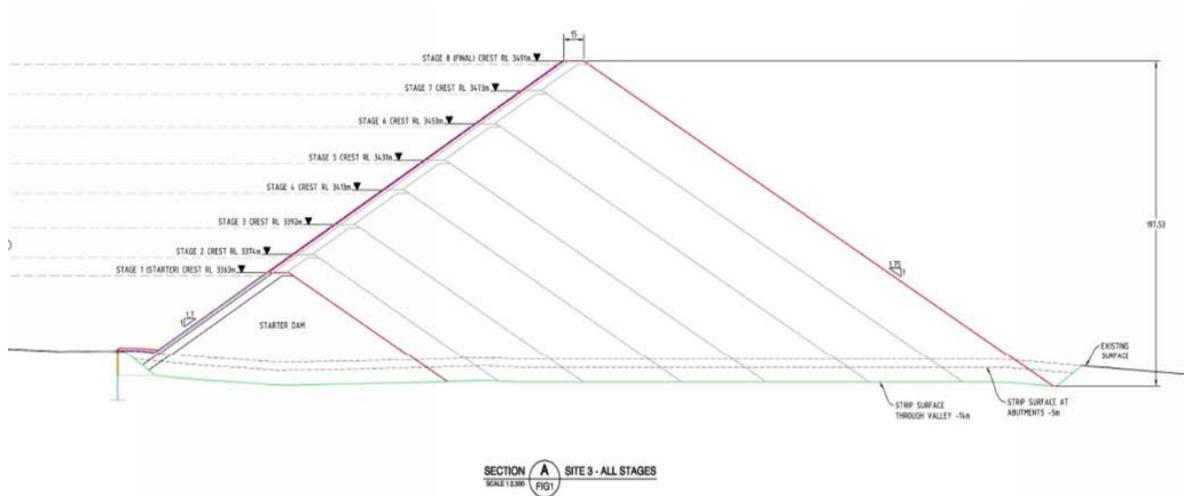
TSF Embankment Typical Section with a Staged Construction
